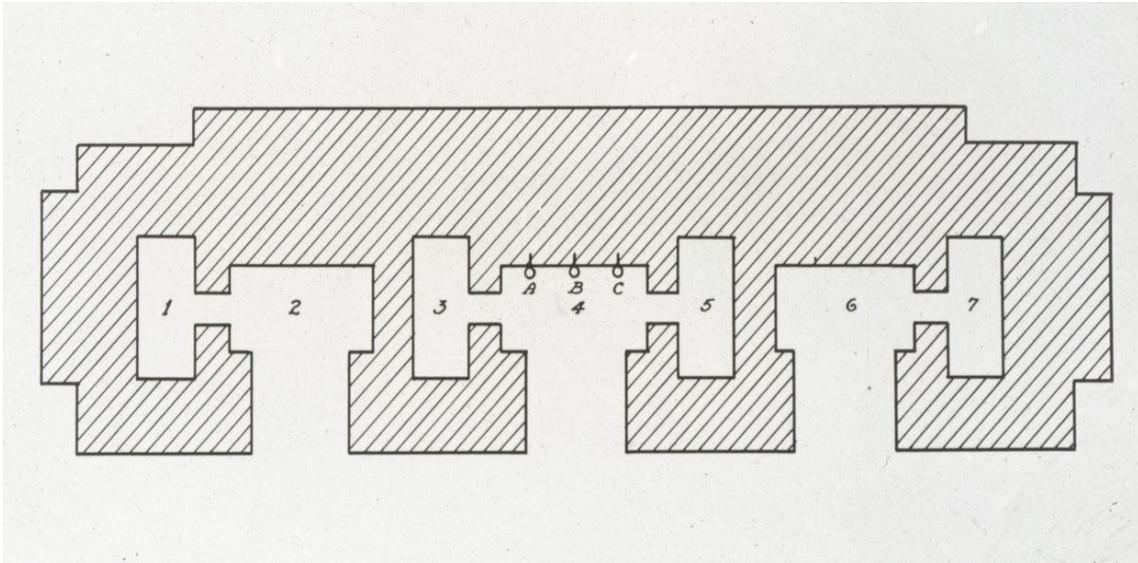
Ground plan of Temple A. Note the proportions of wall space to room space in this building. The walls, which are of solid masonry, occupy nearly three times as much space as the rooms [see also Figure 2.3].
